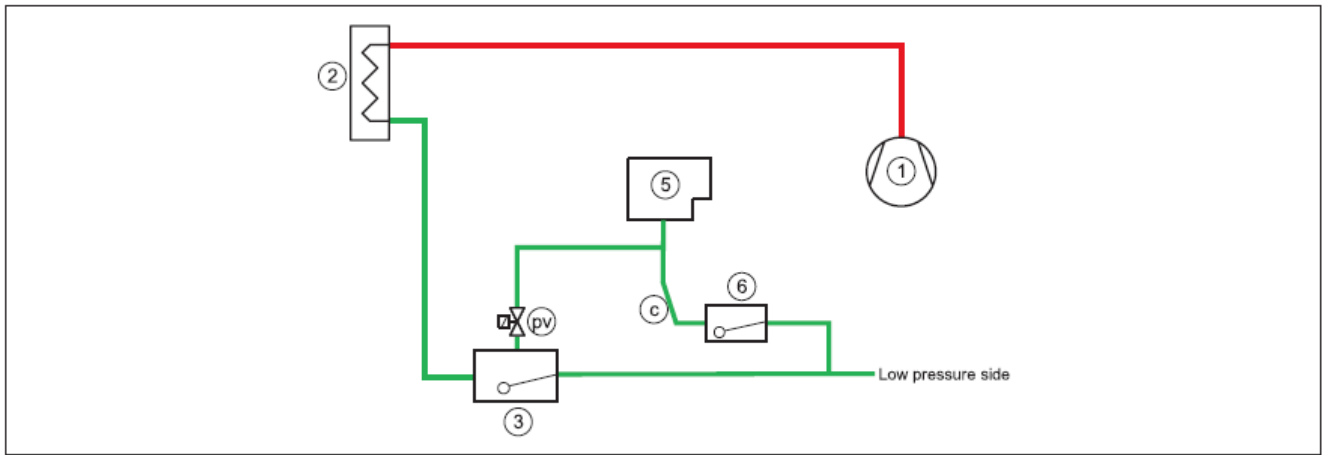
Purger connections (pv). Drain Piping (c) must be vertical/downward slope
